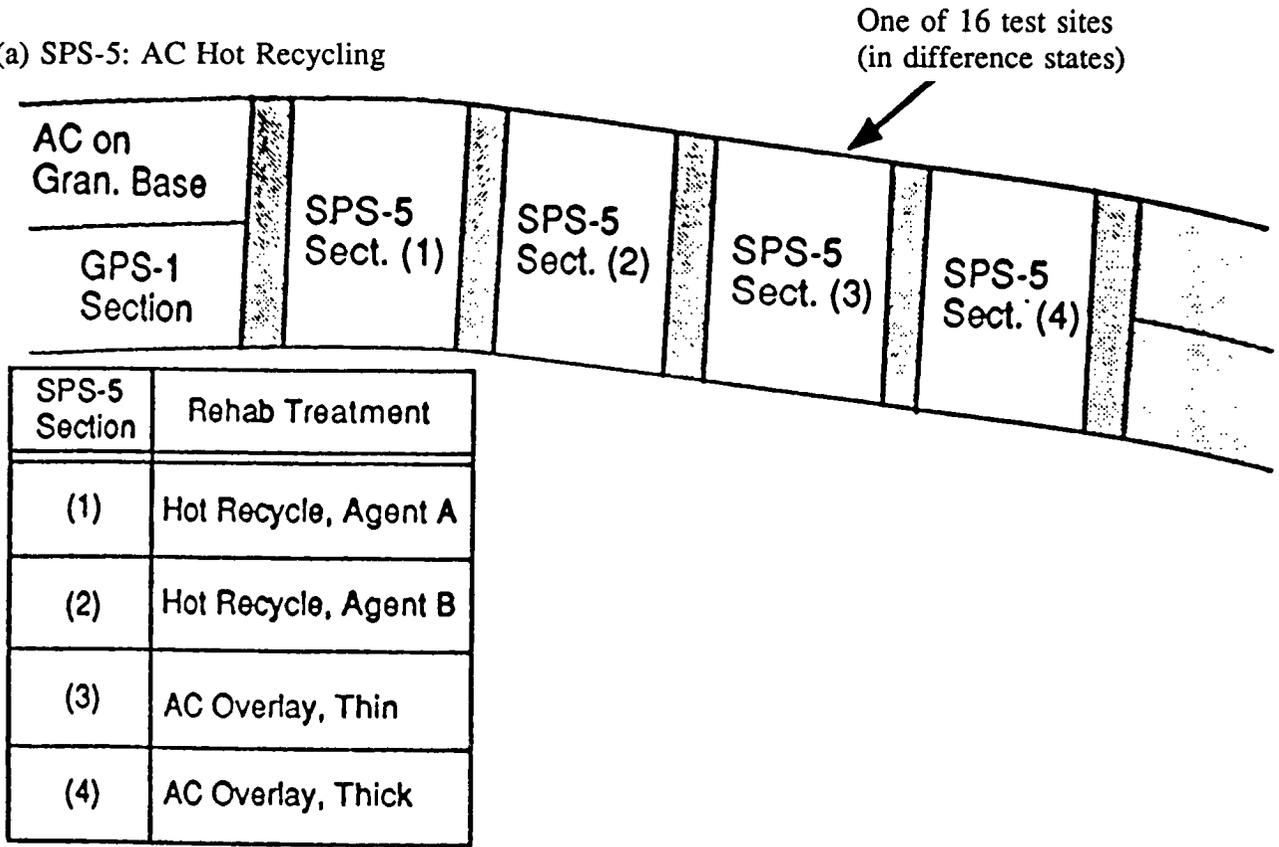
shows the layout for SPS-5 sections. Note that the GPS-1 sections that were not rehabilitated would serve as control sections for SPS-5 projects.
